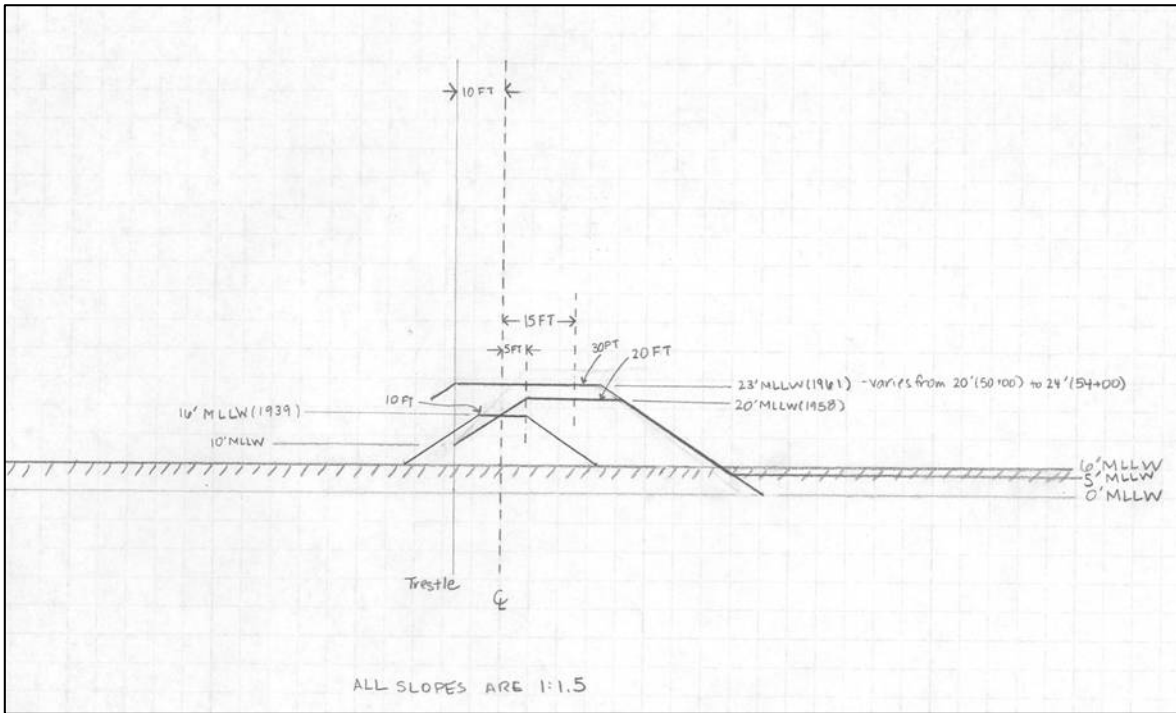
147. Jetty A Cross Section Templates - 41 to 53 – Root
